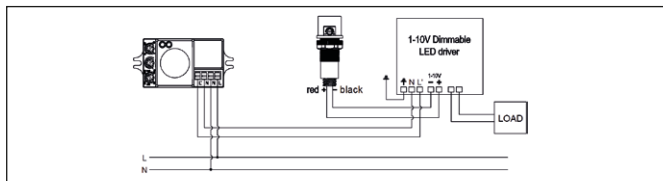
Daylight sensor with dimmable LED transformer and motion sensor
